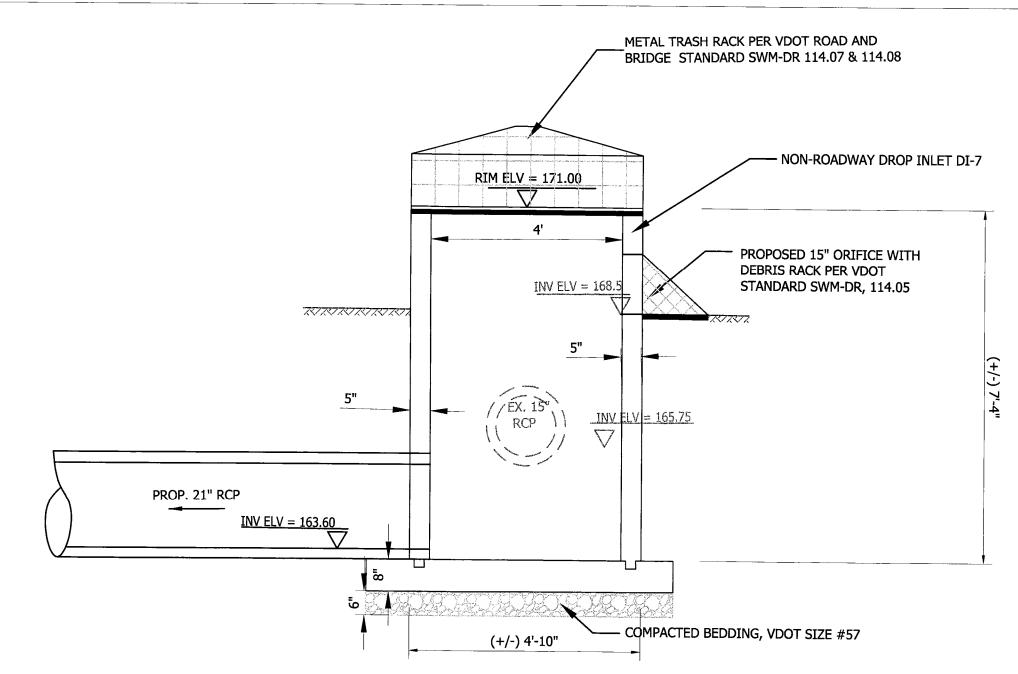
DETAIL FOR VDOT NONROADWAY DROP INLET STR. 22572N SCALE: 1"=2'-0"
